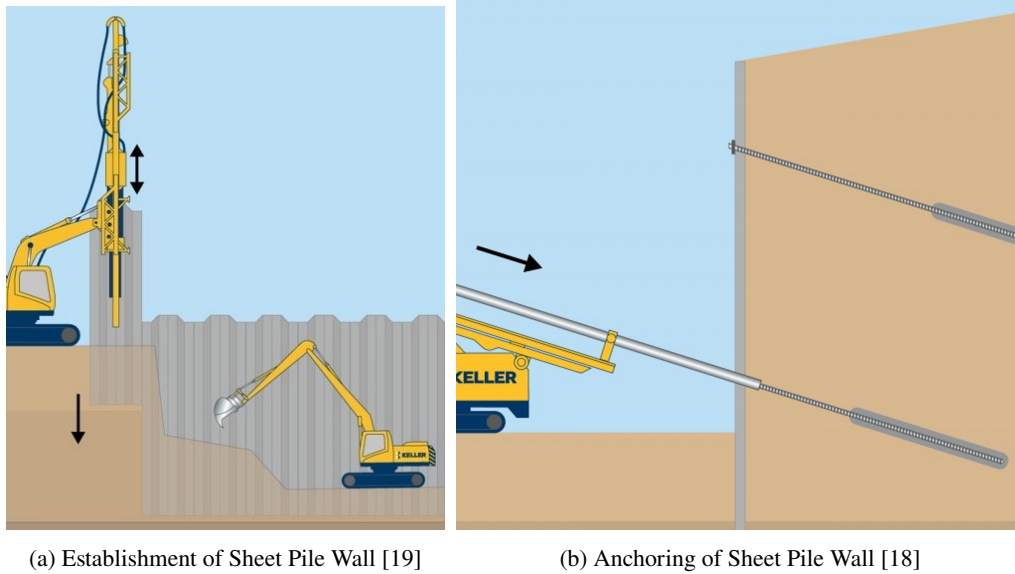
Establishment and Anchoring of Sheet Pile Wall
